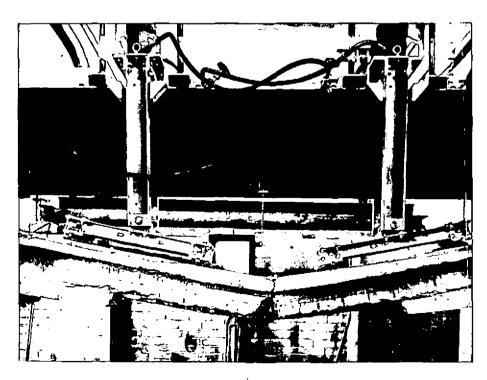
BEAM No.681 (A/1/2/O) AFTER TEST
